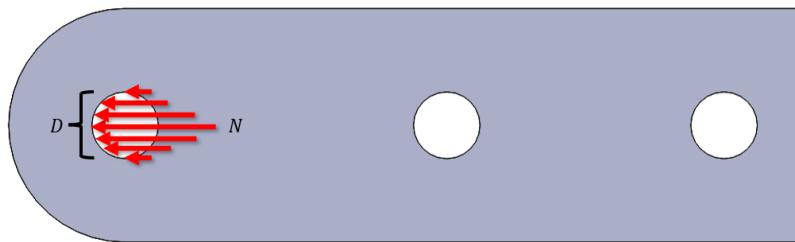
Failure in the gusset plate due to bearing.
